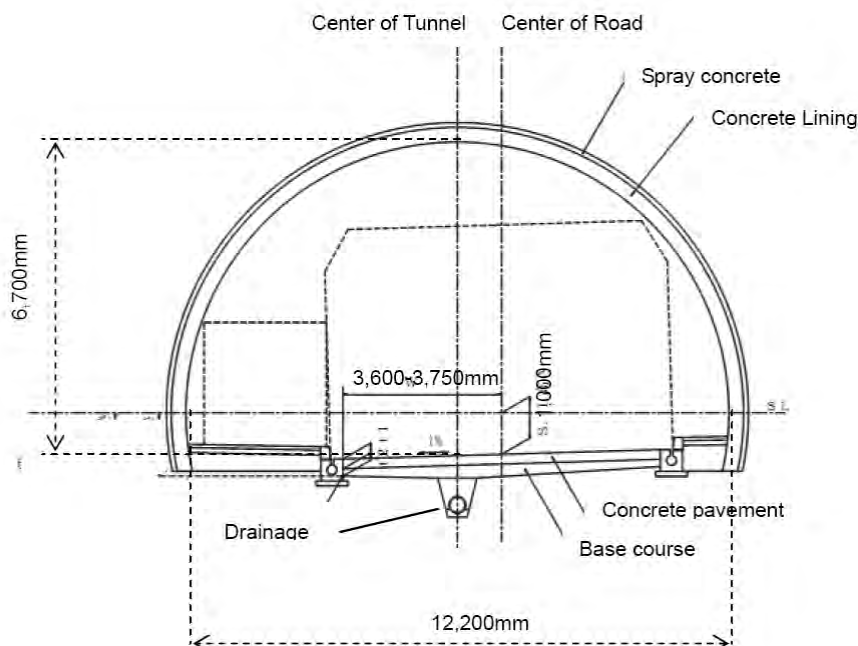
Tunnel Cross Section for 2-Lane Carriageway
